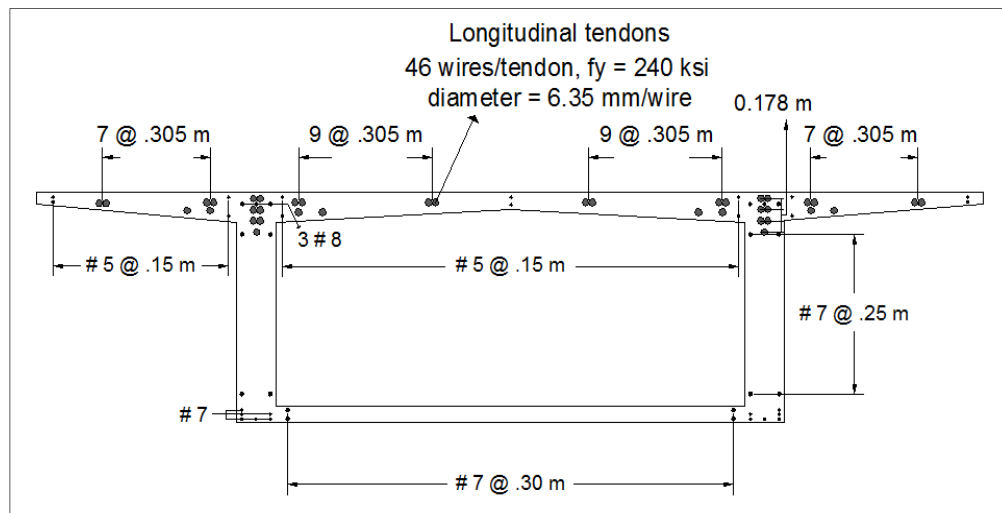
8. Cross-section properties and reinforcement details for superstructure.
